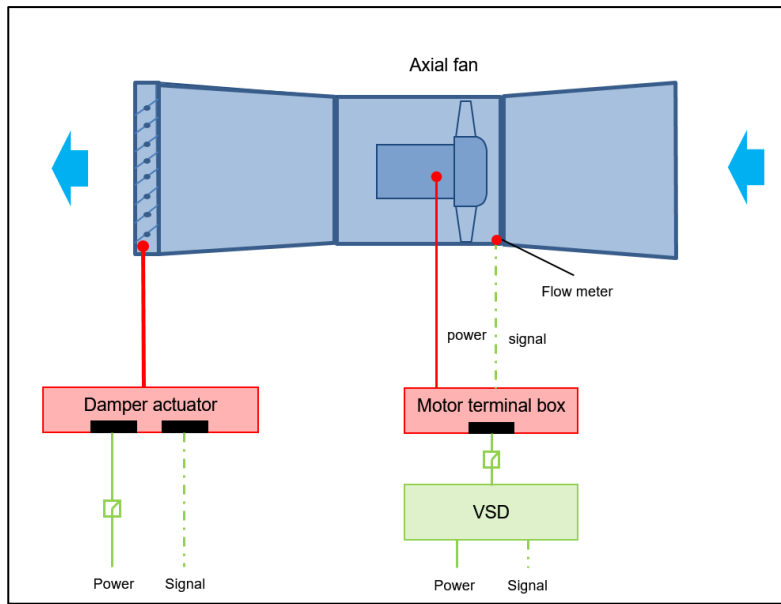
Fan unit with shut-off damper of the egress-tunnel ventilation.
